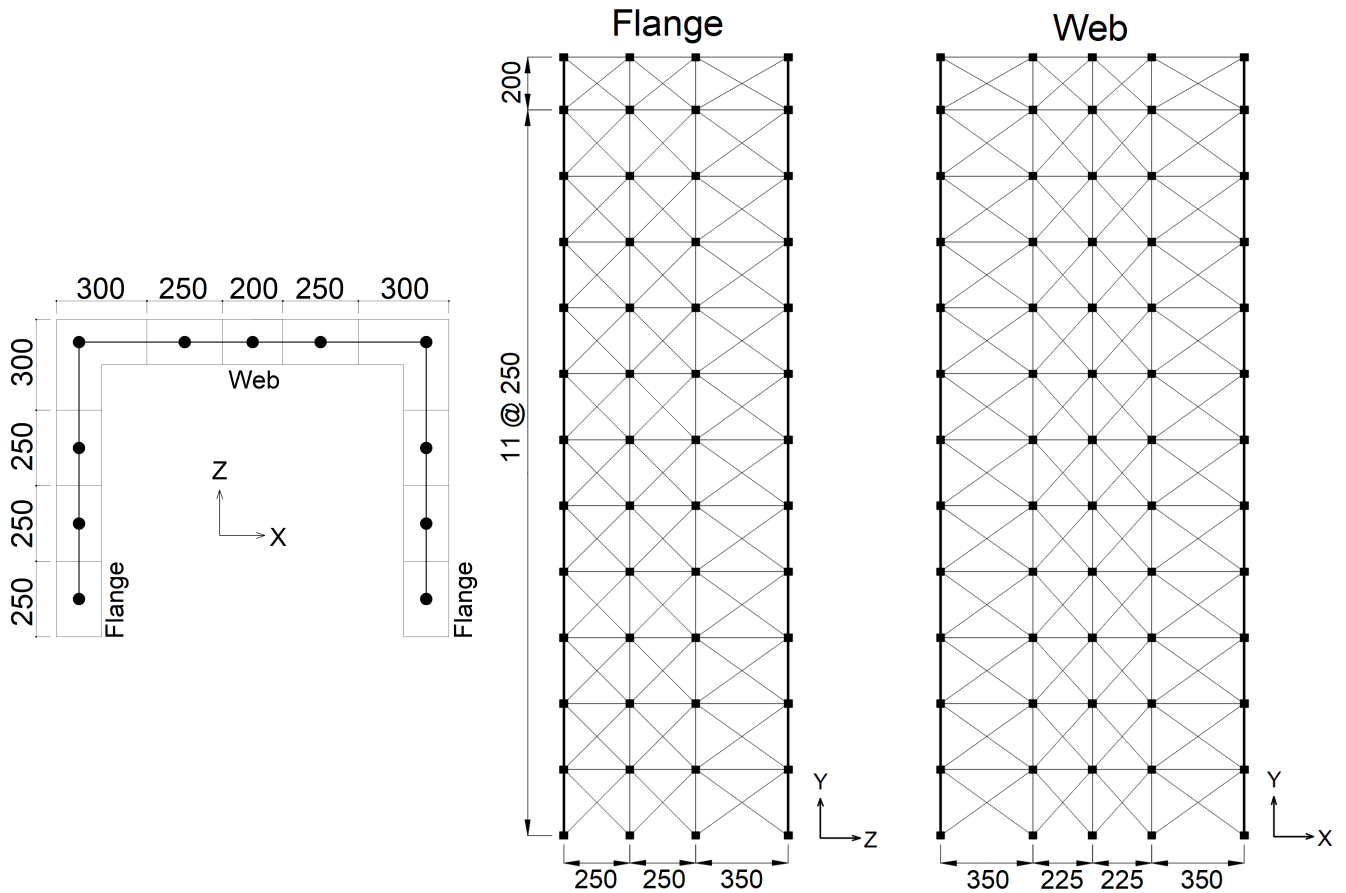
Plan and elevation views of the beam-truss model for TUA [Unit: mm].
